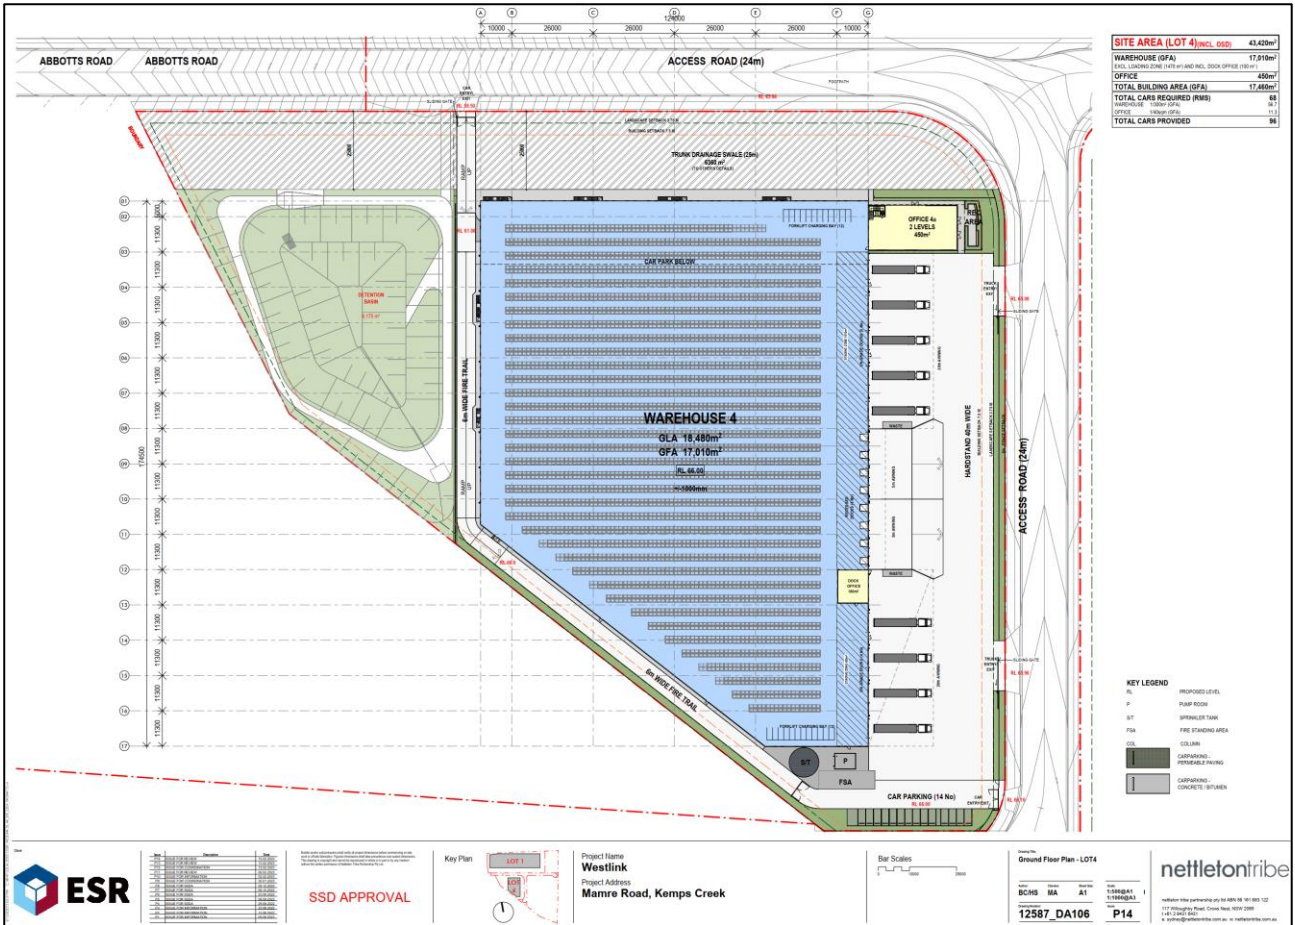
Approved Ground Floor Plan – LOT4, Drawing number: 12587\_DA106, Issue P14, dated 15/02/2023
